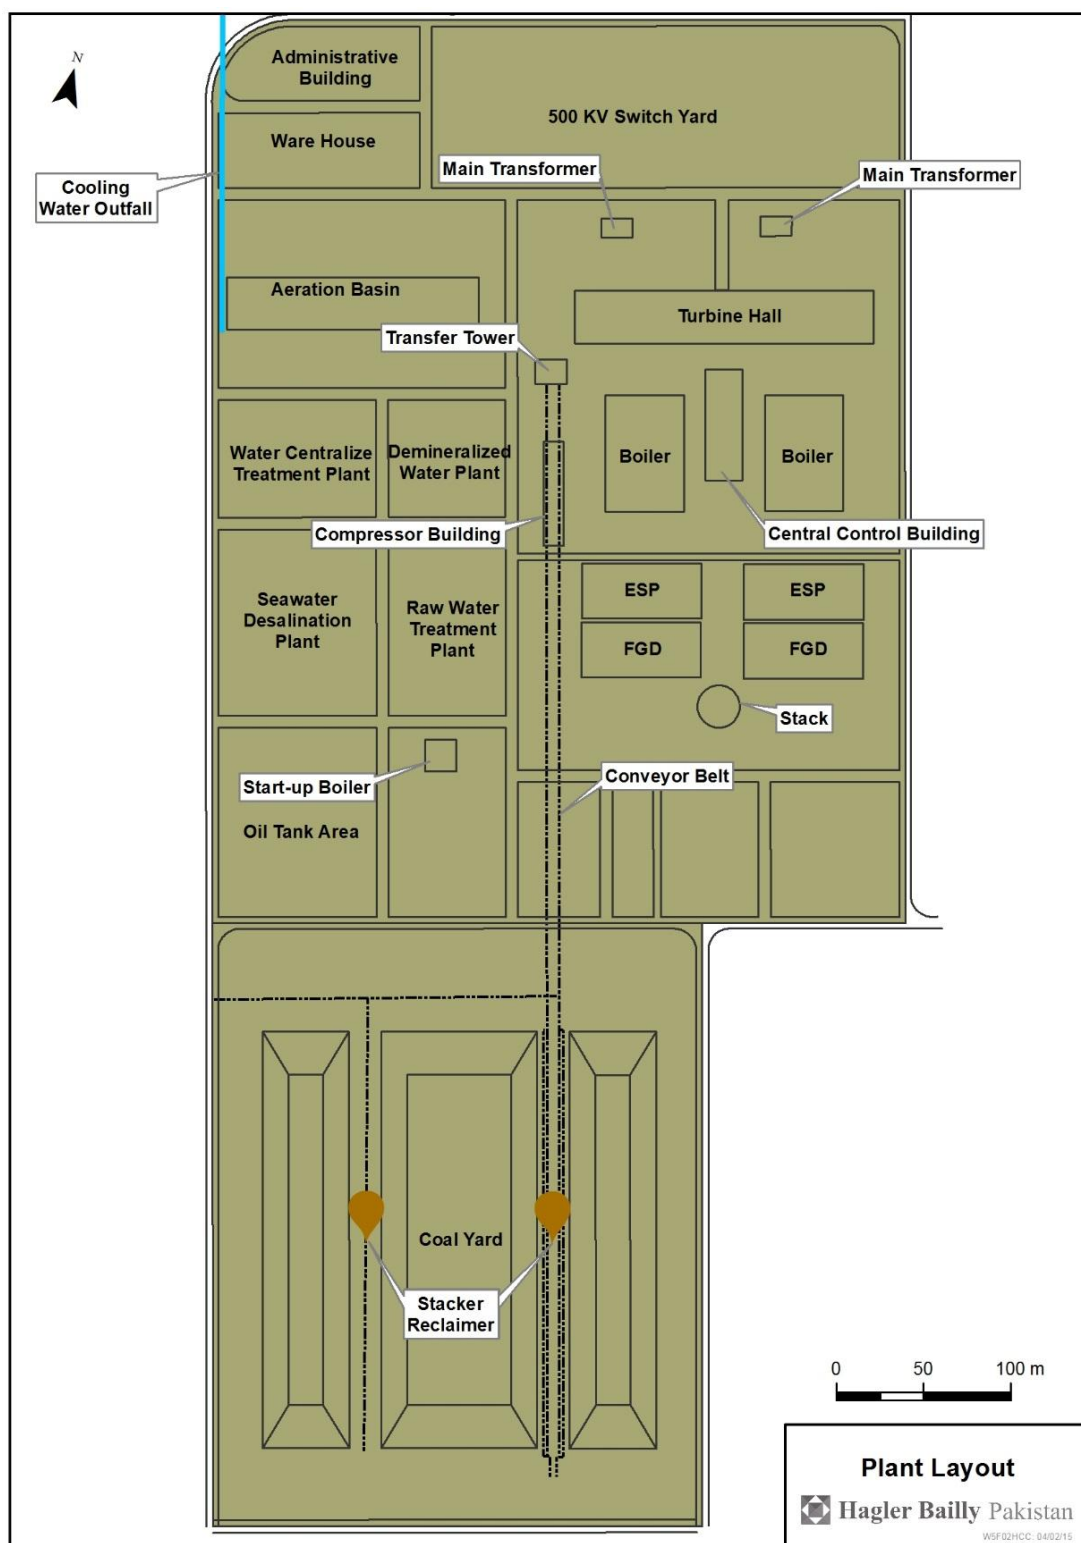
Proposed Coal Power Plant Layout¹
